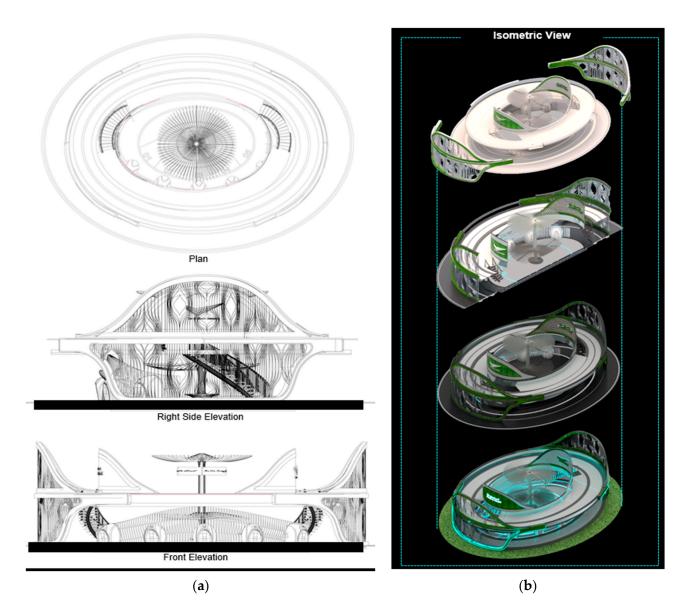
(a) Plan showing the right side and front elevation for the double floor walking track; (b) different isometric views (designed by the authors).
